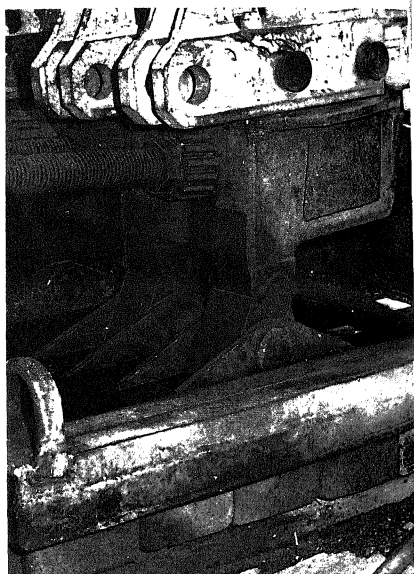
Bridge seat rockers in place between stand and bearing and cable connection beam (tensioning end only).
